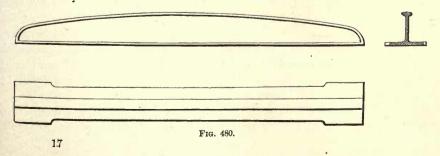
is side elevation, plan, and section of east-iron girder, adopted by him for railway purposes, a pair of girders for each track, the rails being supported on wooden cross-beams.
